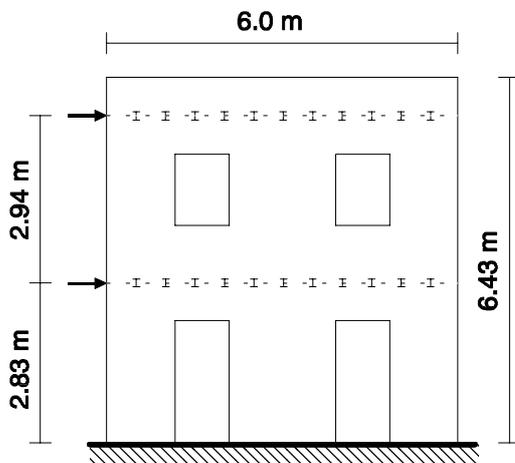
Longitudinal wall of the masonry building subjected to cyclic static testing.
